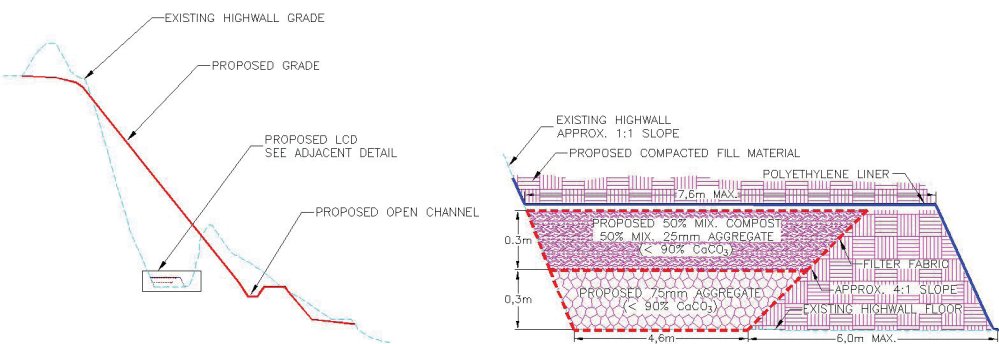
Lime Compost Drain (LCD), Typical Cross Section and Profile, Not to Scale (image: Olga Moya Aranzubia).
